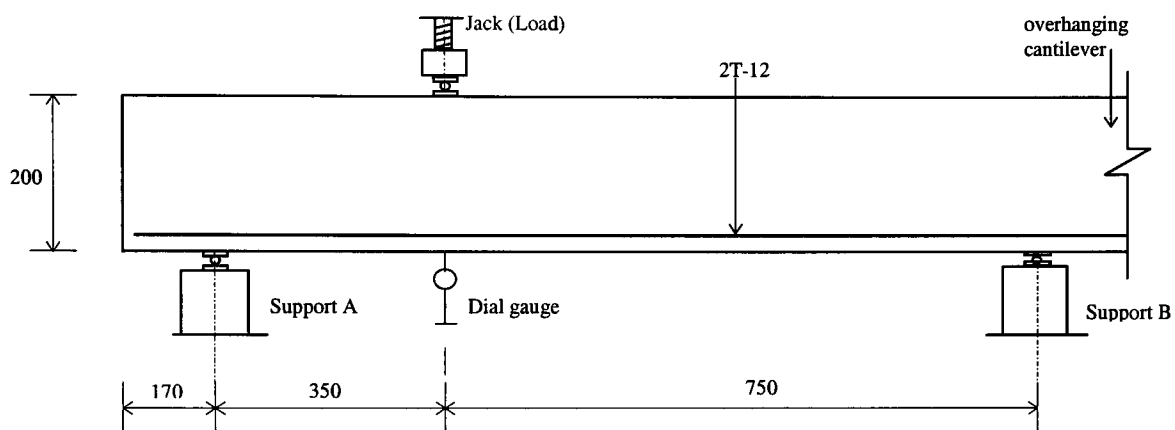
Test set-up (all beams except beams 2A-4, 2A-5, 2B-5 and 2B-6)
